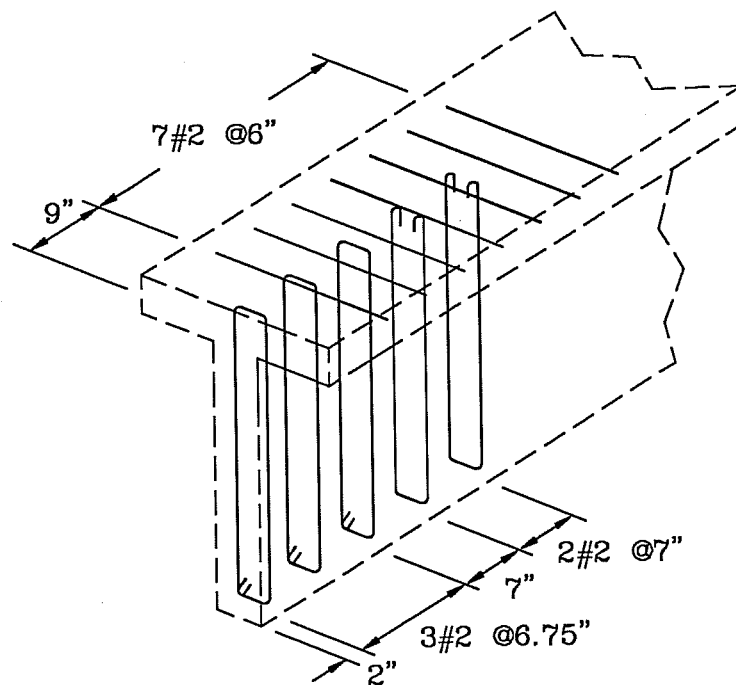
General Zone Reinforcement of Specimen F with Anchorage Zone in a Flanged Section
